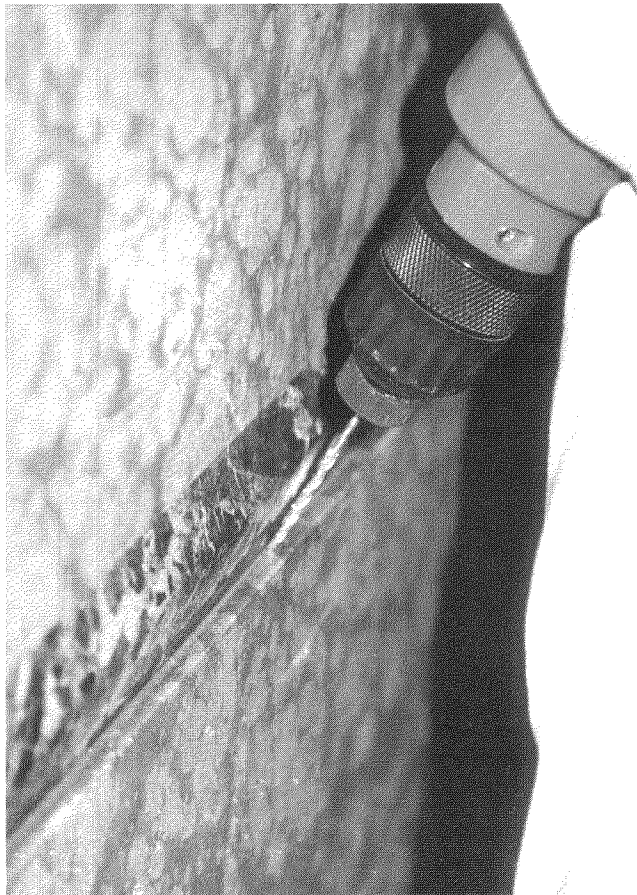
A 0.08-cm ($1/32$ -in.) hole drilled at 45° to accept the tail of the mechanical fastener.
